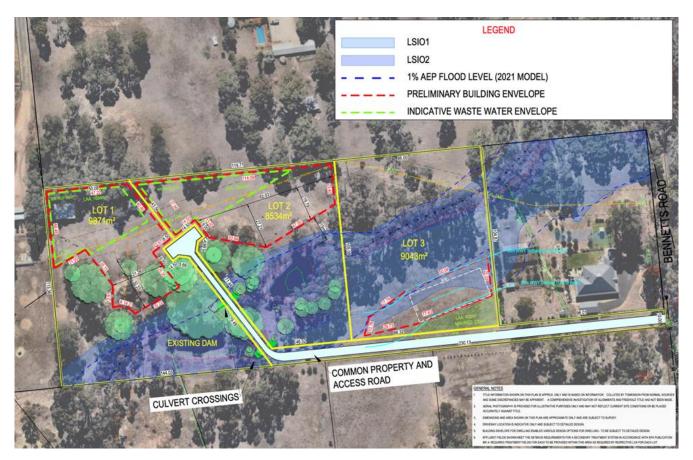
Extract from concept plan for proposed subdivision, indicating lots, building envelopes, and waste disposal fields.
